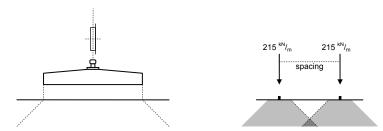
Crane track on sleepers and transfer of loads to subsoil
